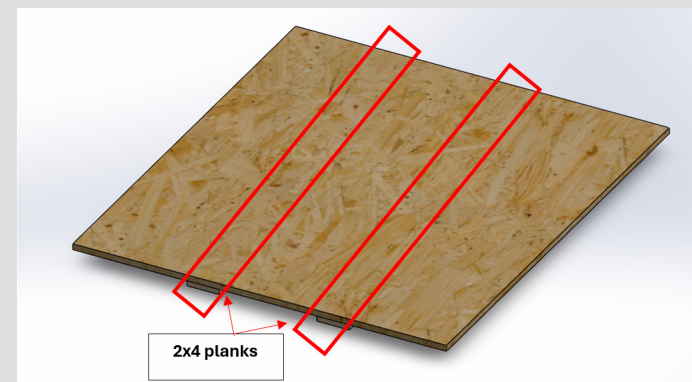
Plywood floor panel with 2x4 wood planks spanning underneath.
